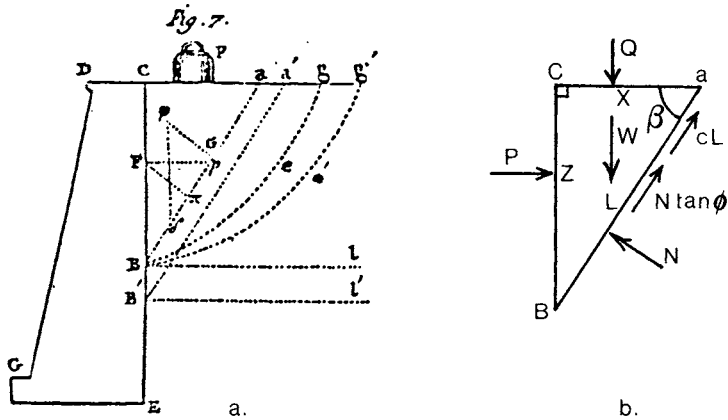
(a) Coulomb's (1776) drawing of active soil failure behind a smooth retaining wall (lines gB and g'B') and approximate straight line failure planes aB and a'B'. (b) Contemporary notation for the forces.
